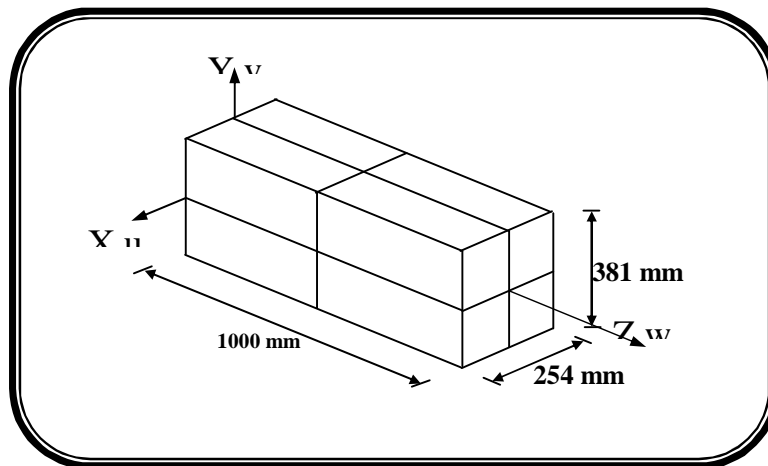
Hsu beam (P8), dimensions and reinforcement details.
